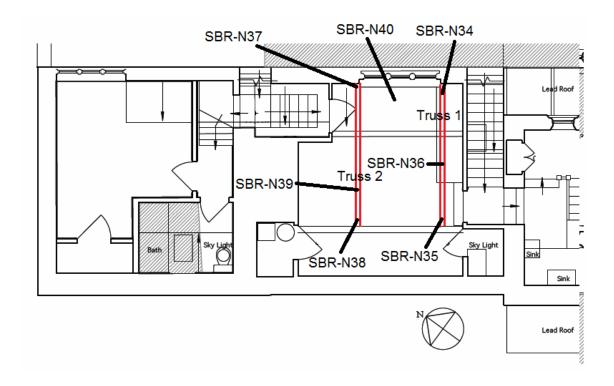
First-floor plan showing the position of trusses in the south-rear range and the location of samples SBR-N34-40 (Blackett-Ord Conservation)
